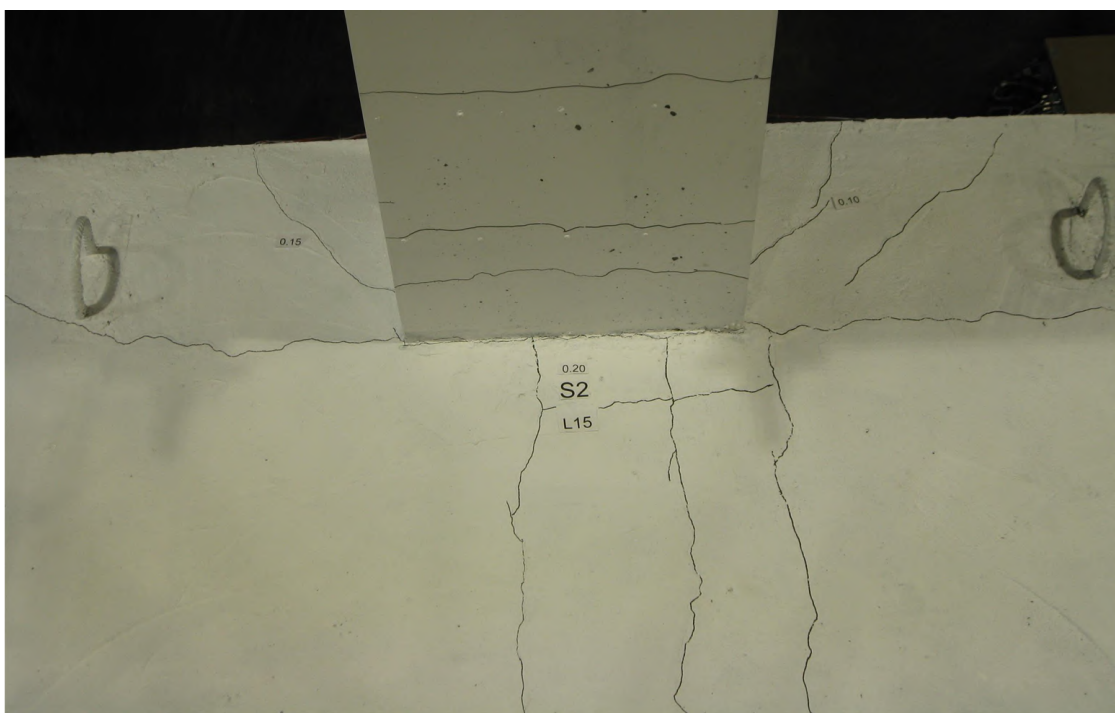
Specimen 2 slab cracks at $V = 165.0$ kN
